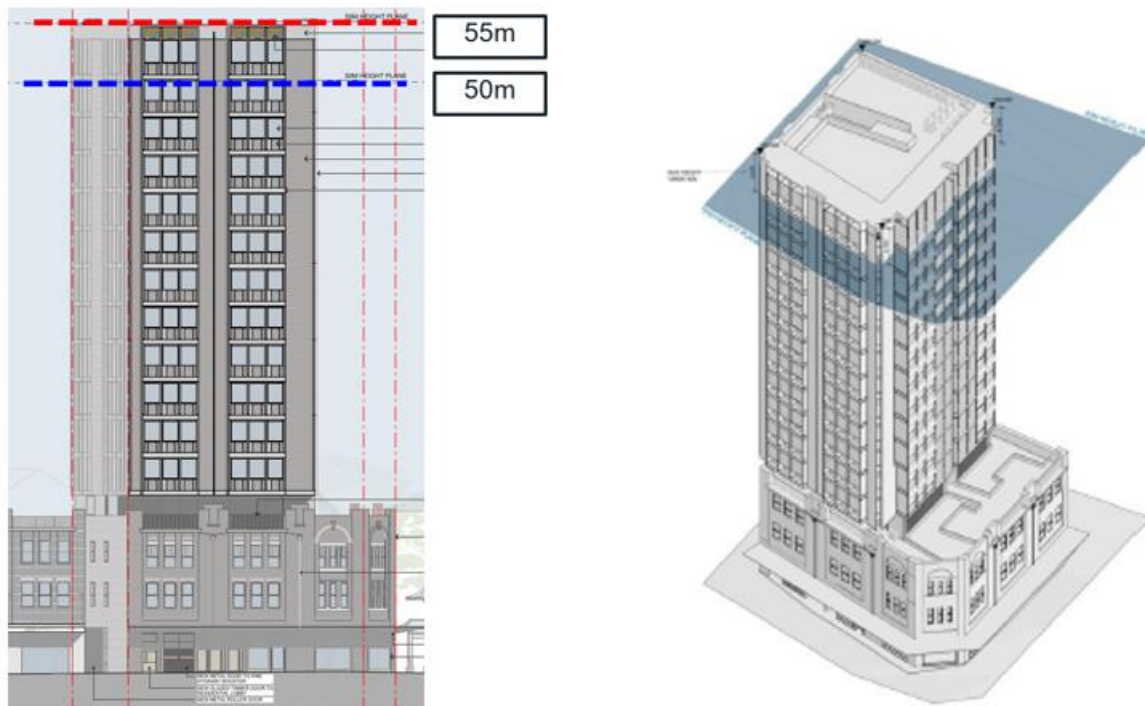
Proposed height of building (inclusive of parapet and roof plant).
